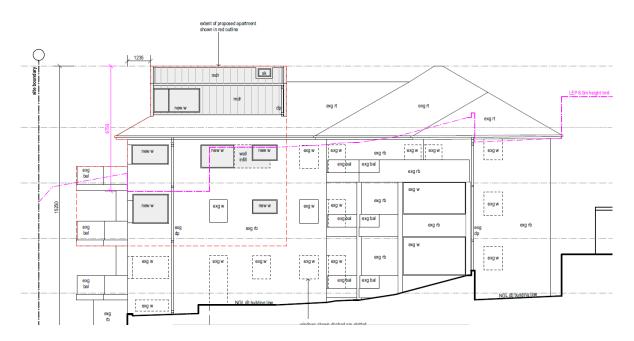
Plan extract depicting the existing and proposed building height breaching elements.
